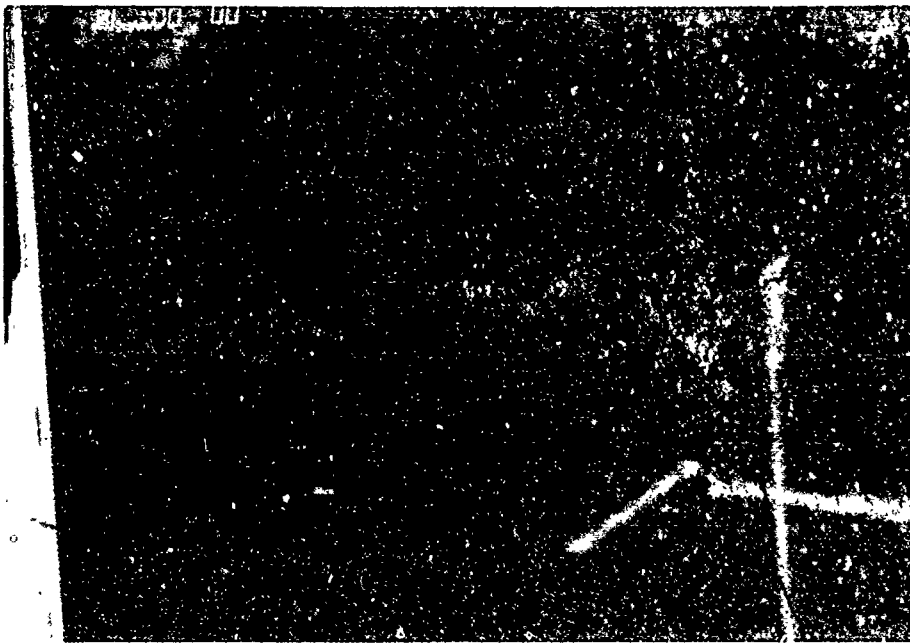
Linear Reflective Cracking, Section 18 (SAMI).
